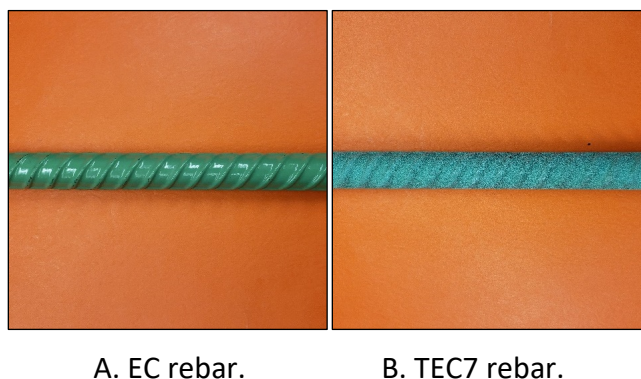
Photo. Surface appearance of the No. 5 steel reinforcing bars used in the large-scale bridge deck specimens.
